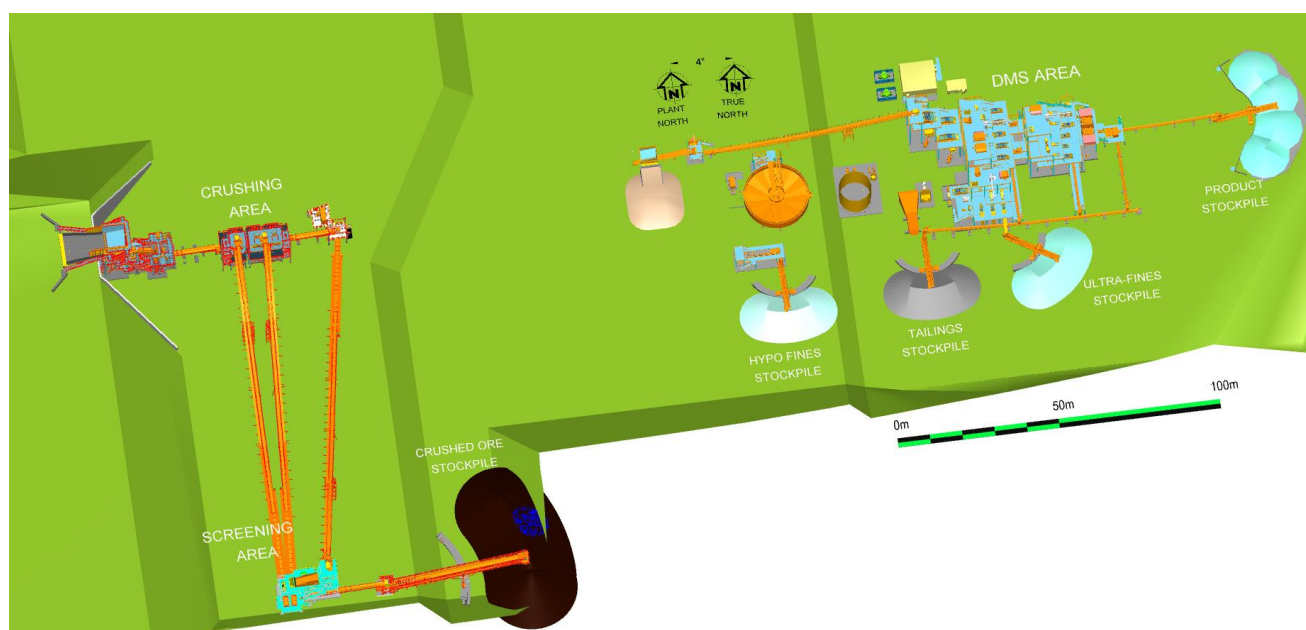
Process Plant: In-house Crushing and DMS Plant
